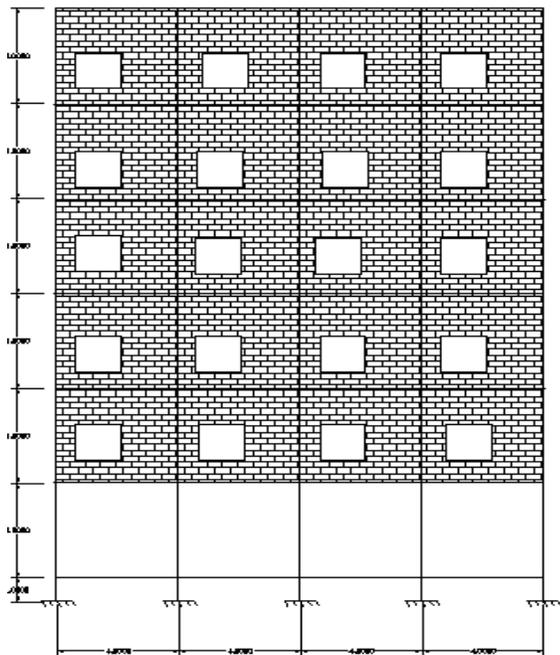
; MODEL IV: INFILLED FRAME WITH CORNER OPENING
